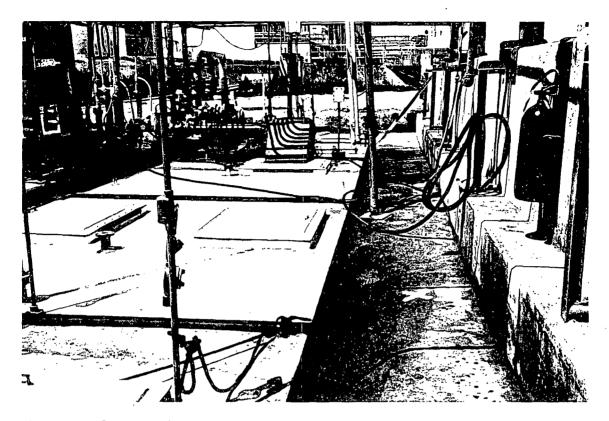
Lubrizol - Reg. No. 30324 - 4/14/88 No. 2 Lift Station, proposed boring location SB-2A, looking west. Patrick Bayou culvert in the background.
